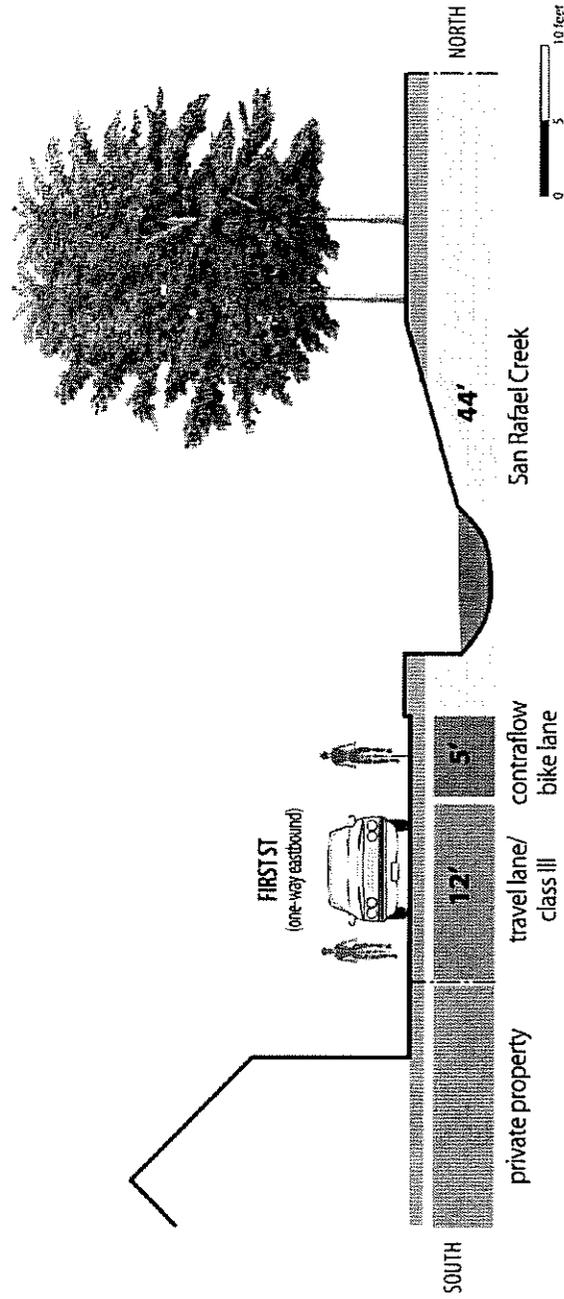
Section of Proposed Improvements for Project 13: First Street (E Street to D Street)
